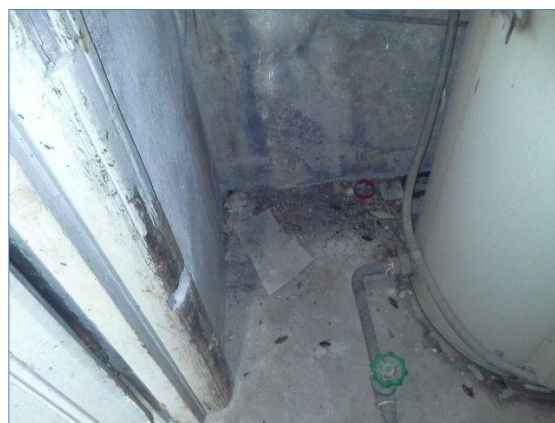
Courtyard 2.39 - Asbestos cement ceiling lining to entrance to 2.41
